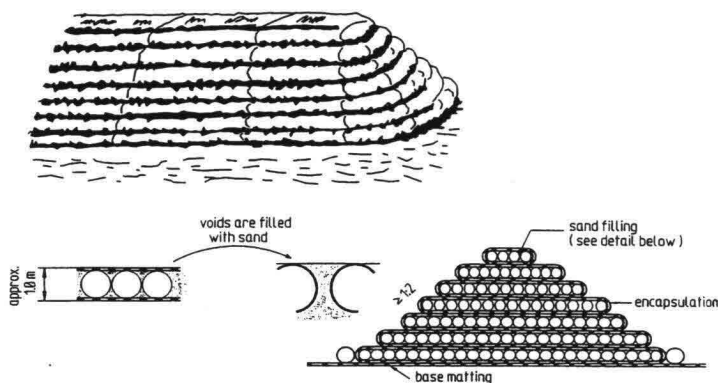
Construction of a geotextile groyne at Kirra, Australia (from (4))
